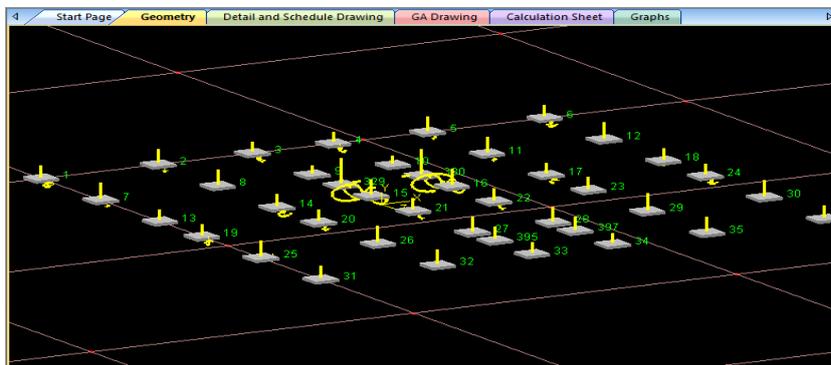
Column Markings from STAAD file for Foundation Design
